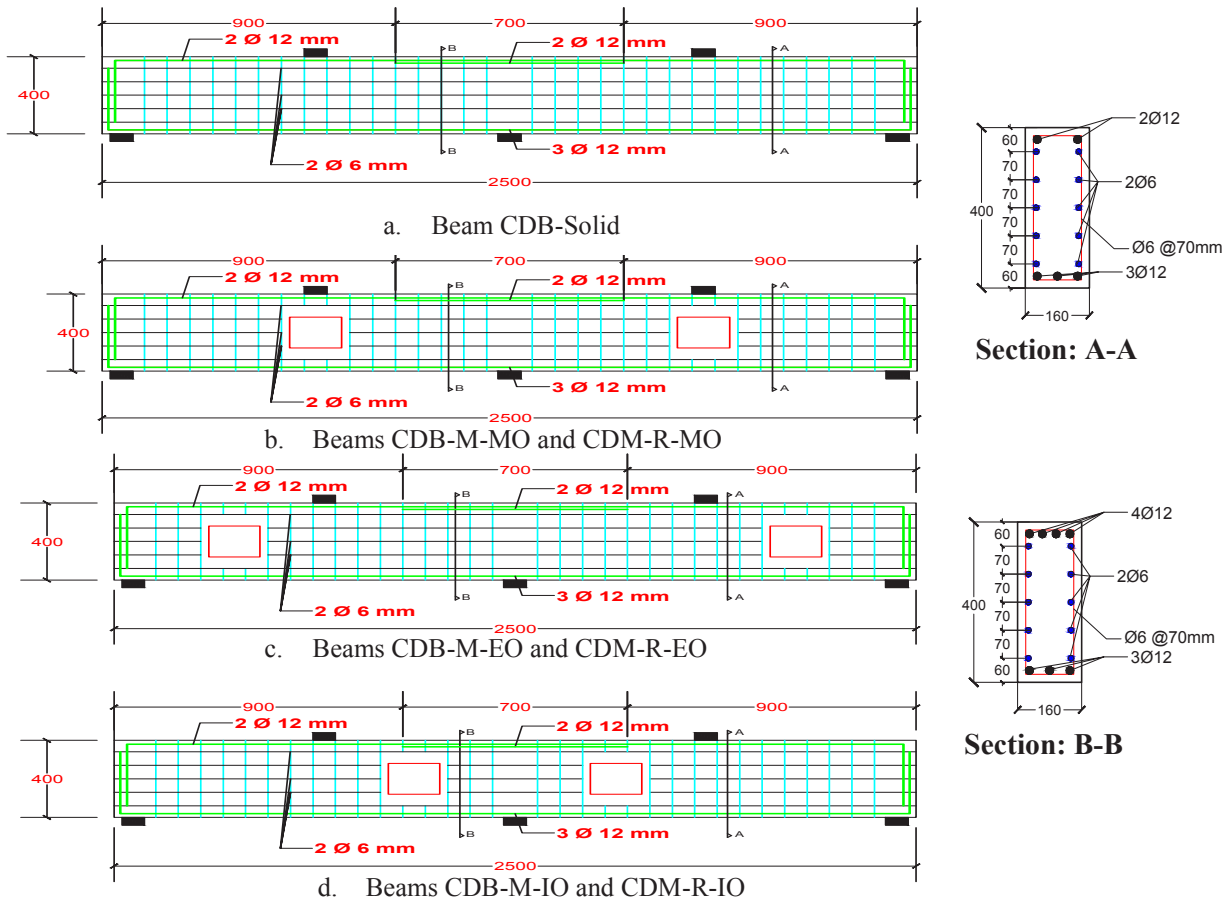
Details of steel reinforcement for typically tested beam (all dimensions are in mm).
